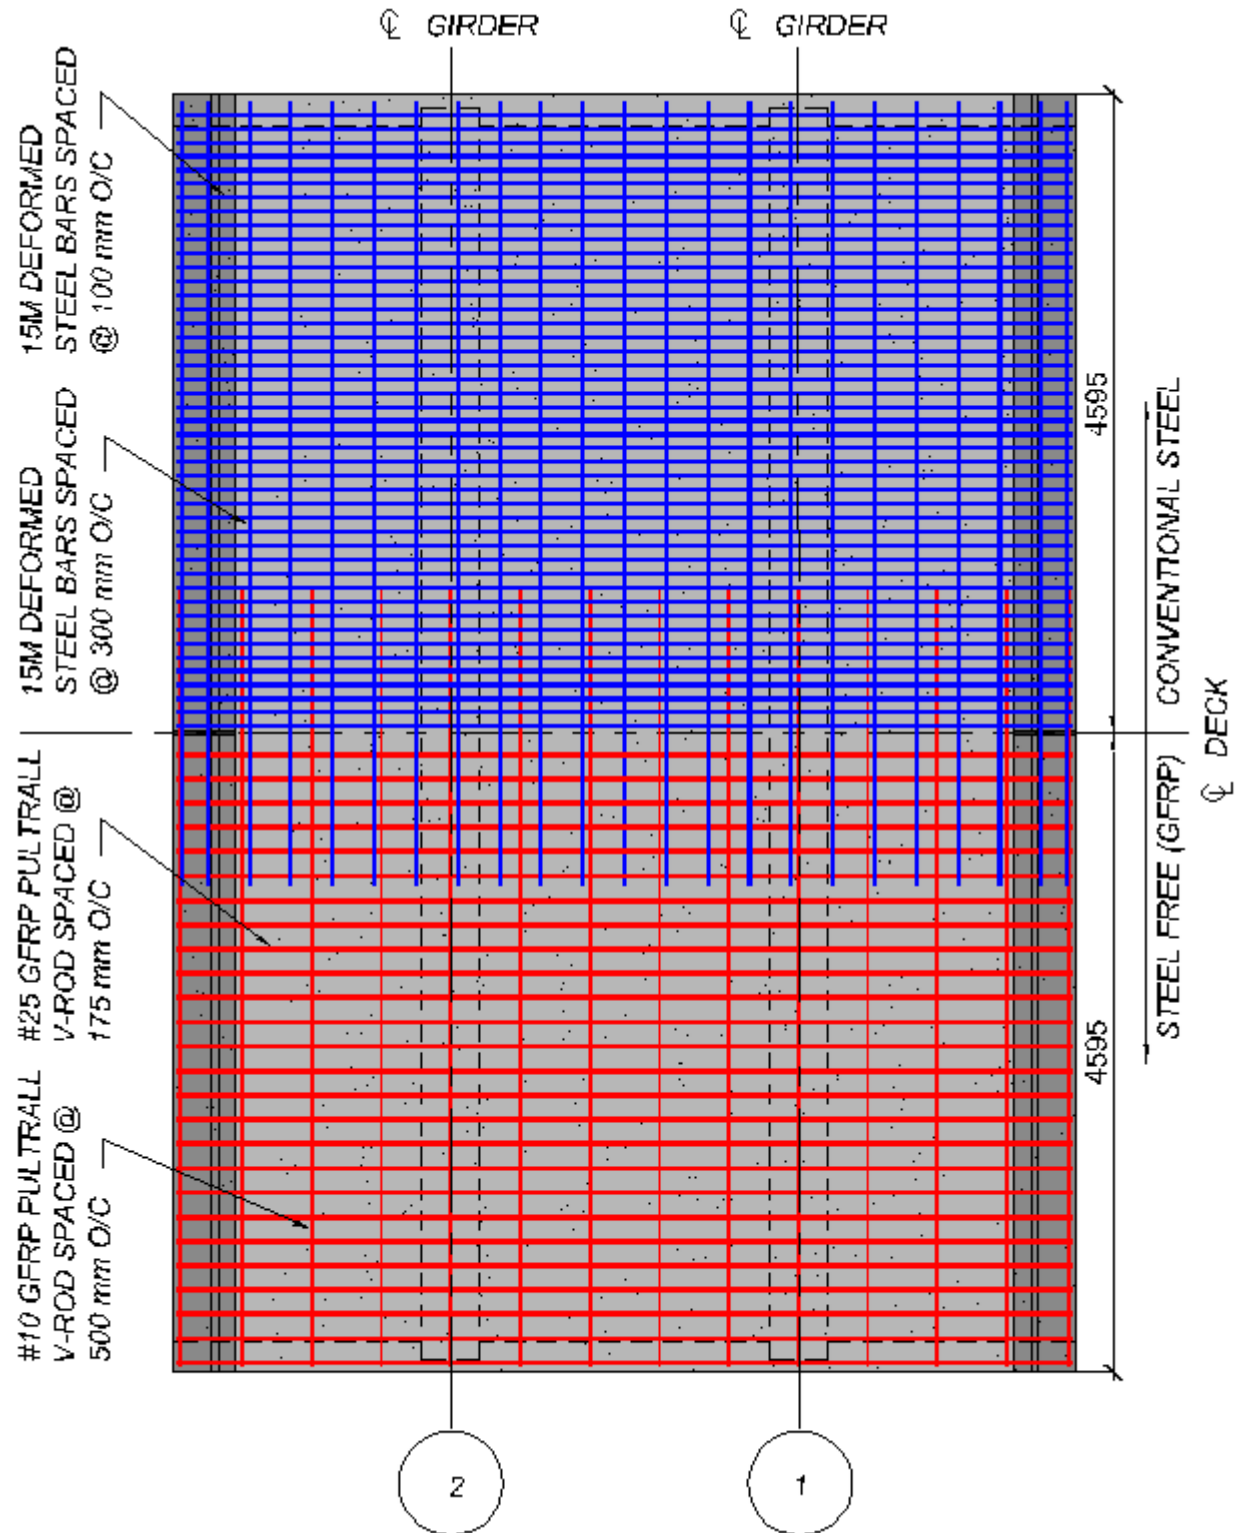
Plan view of concrete bridge deck slab with top internal reinforcement schematic used in this experiment.
